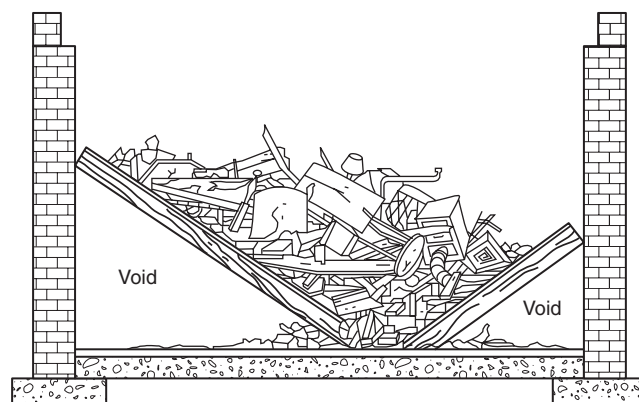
(b) V-Shape Floor Collapse. (Courtesy of U.S. Department of Civil Defense)
